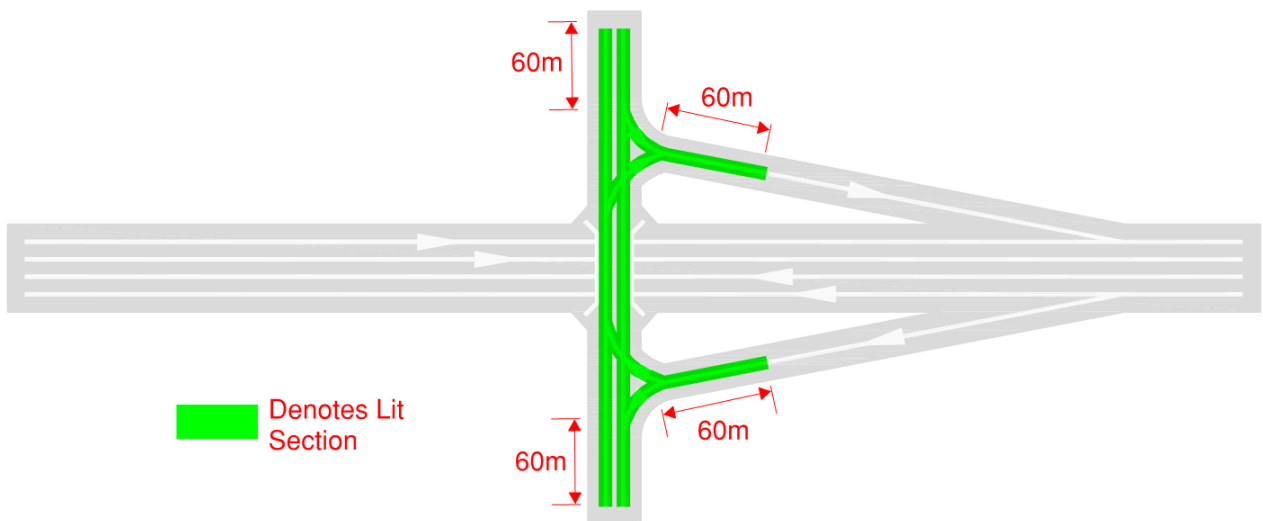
Lighting Extents for a Typical Layout of a Half-Diamond Junction
